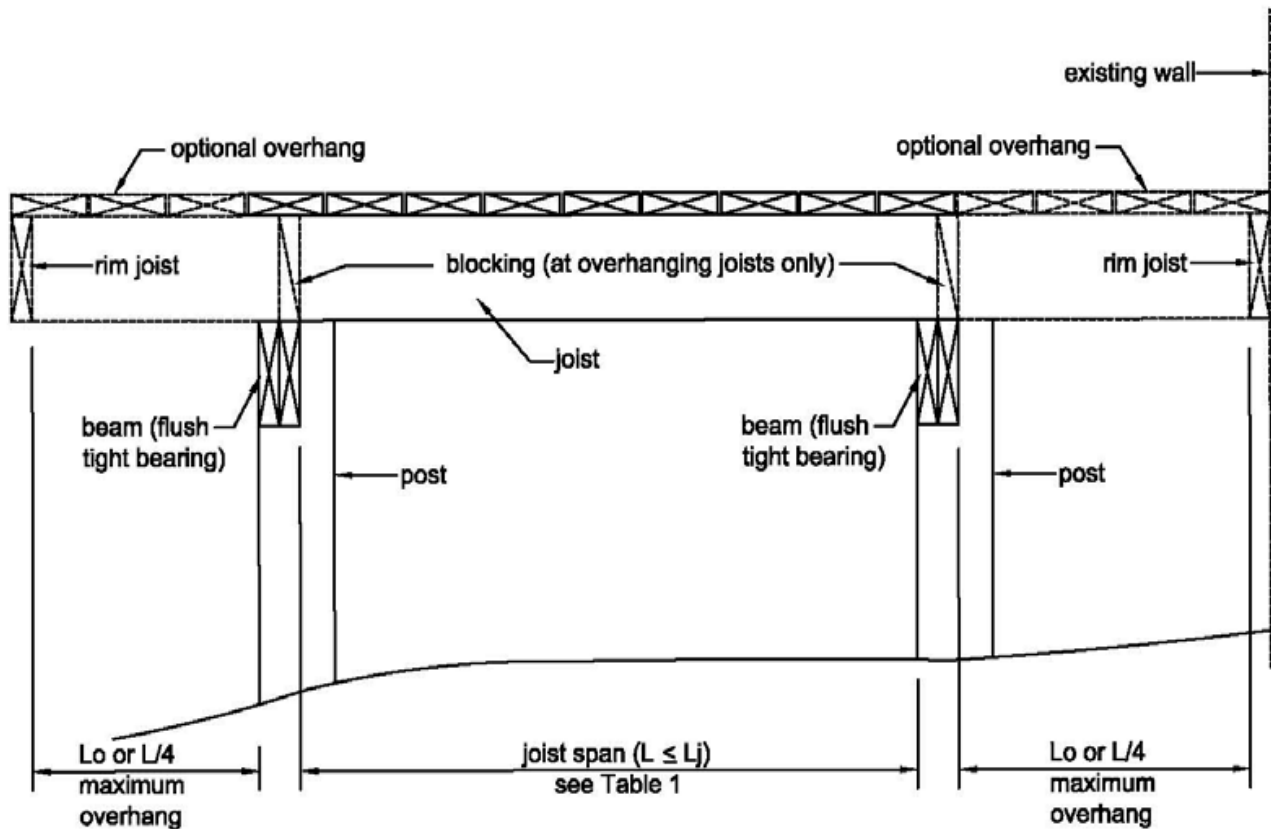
Joist Span – Joist Attached at House and Bearing over Beam
